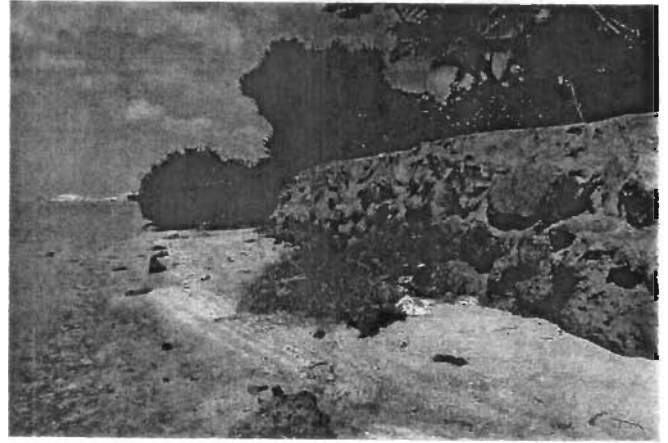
Sea Revetment (makai, Keehi Lagoon on left)
